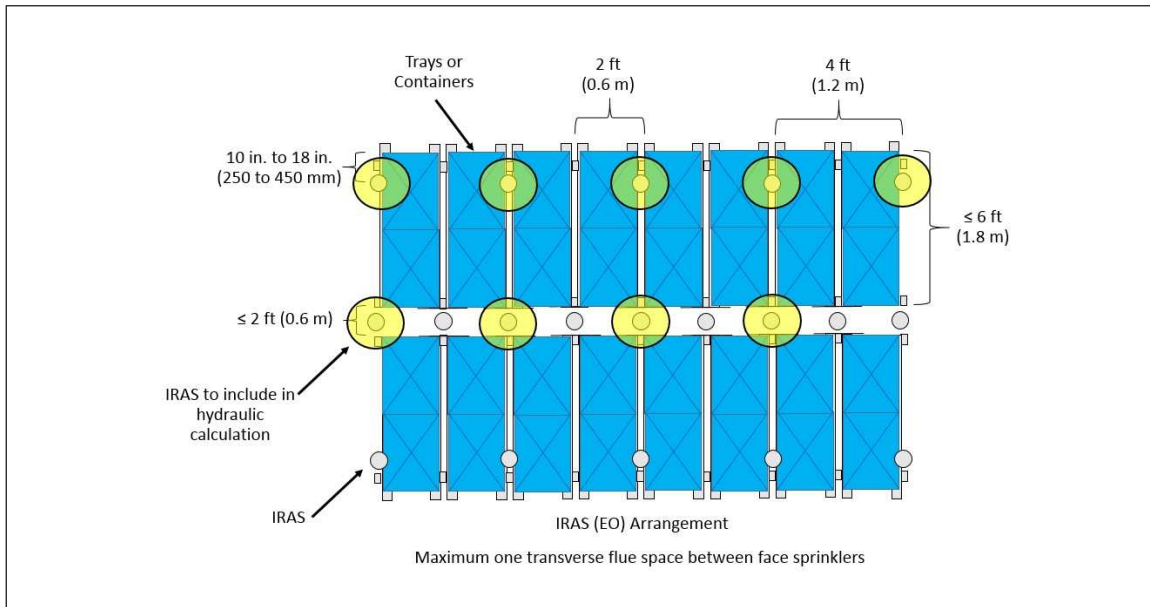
Example of which in-rack sprinklers to choose when the IRAS design is based on 9 sprinklers and longitudinal IRAS are 2 ft (0.6 m) apart
